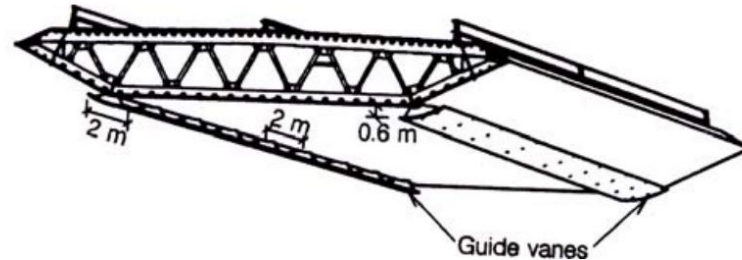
Arrangement of guide vanes along the bottom side panel joint of the Great Belt suspension bridge cross section [107].
